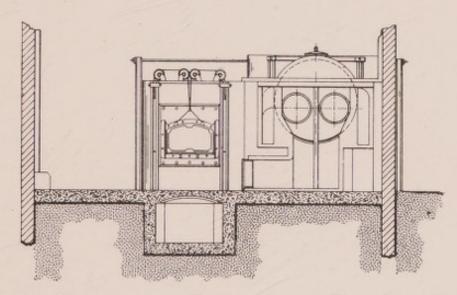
GRAYS COMBINED DESTRUCTOR AND ELECTRICITY WORKS. Sectional Elevation.
